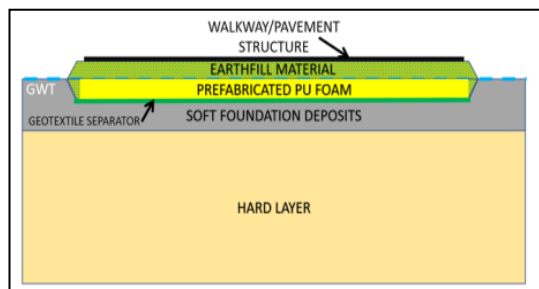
Typical cross-section of PU foam construction at shallow depth of road foundation.
